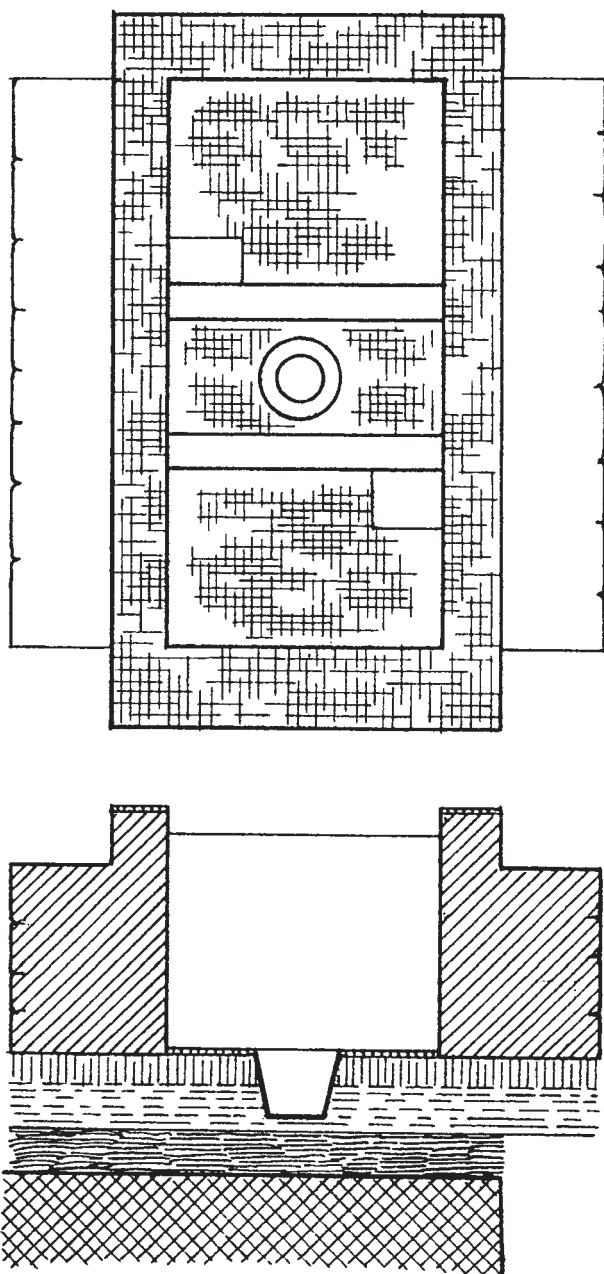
Plan and section of the tripartite plastered installation paved with white mosaic stones (redrawn according to archival plan).
